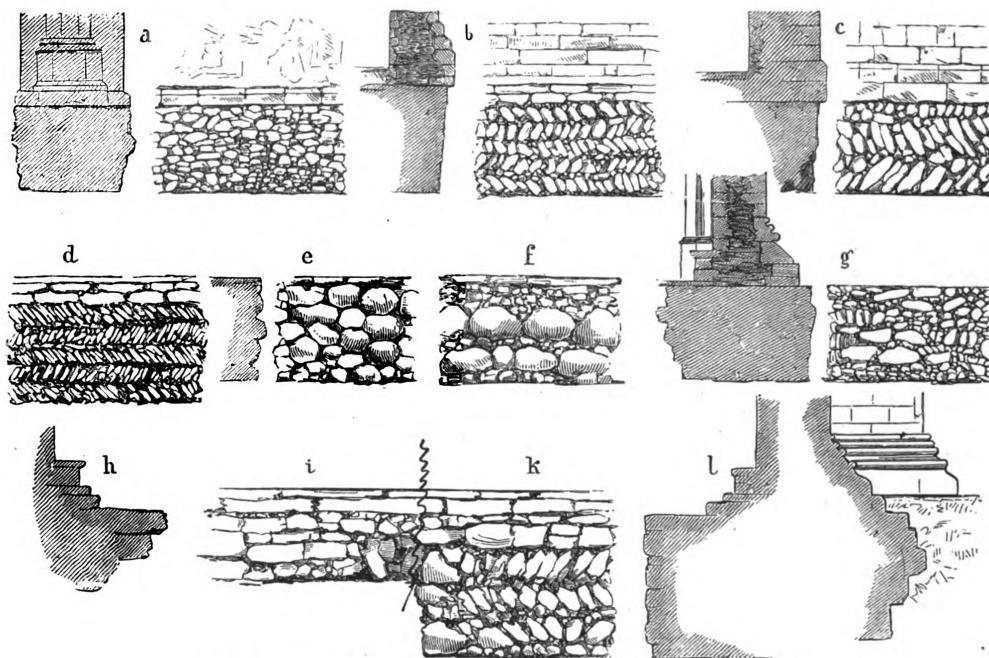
Cathedral of Nidaros. Foundation masonry, after O. Krefting.
